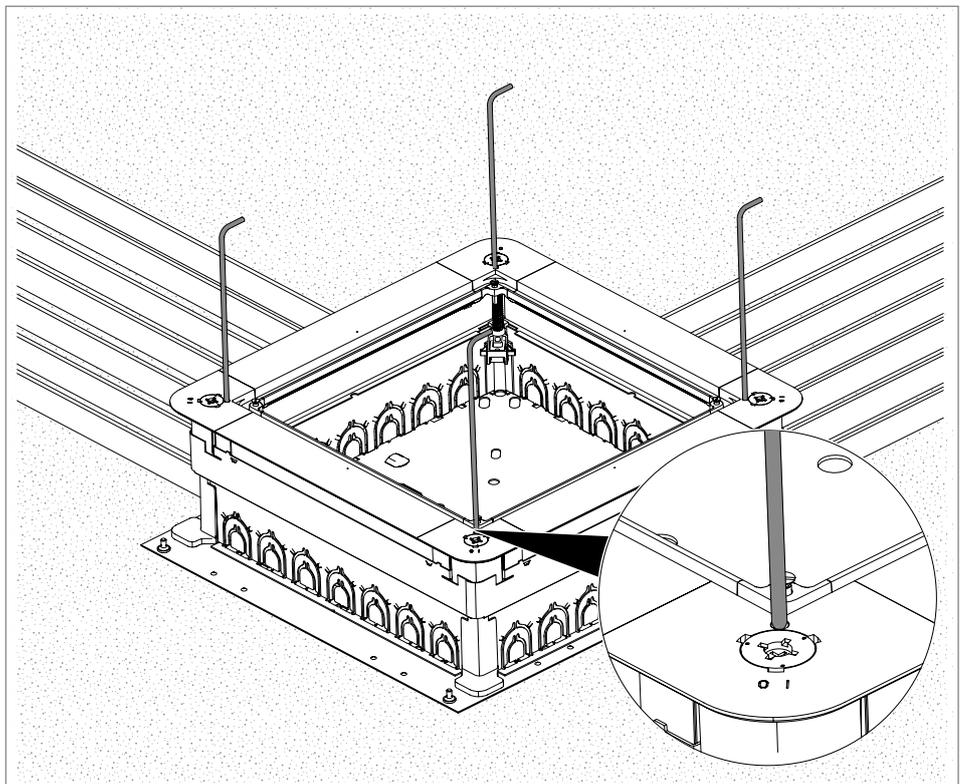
Adjusting the height of the UZD underfloor accessory socket
